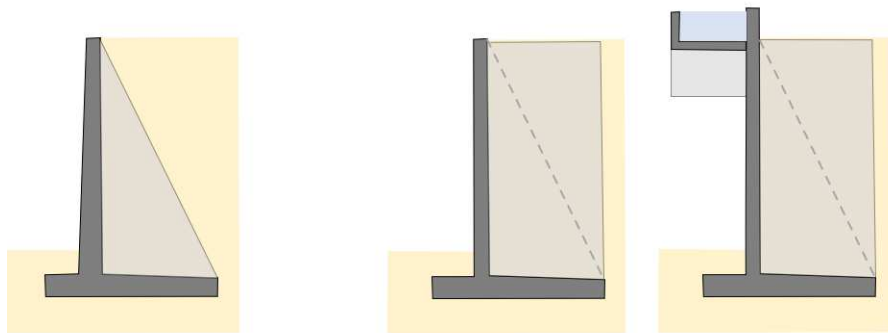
Typical cantilever retaining walls with counterforts / Wadi cascade retaining walls with vertical counterforts /
